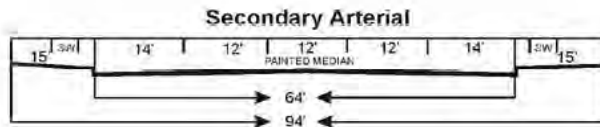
EXHIBIT K - CITY OF PERRIS GENERAL PLAN TYPICAL STREET CROSS-SECTIONS
